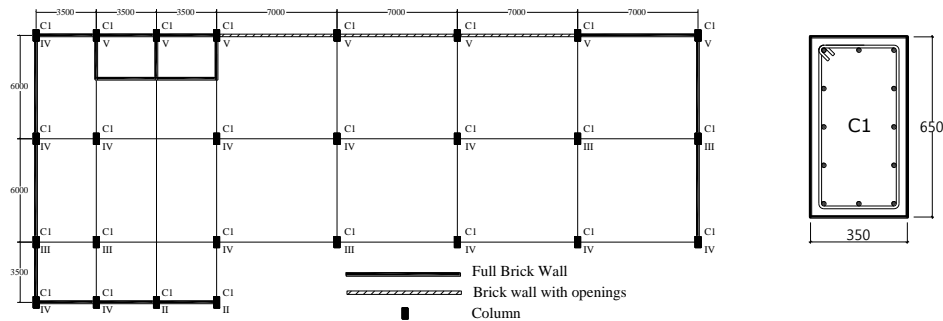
Floor plan first story and damage class of columns of Fire Station building
